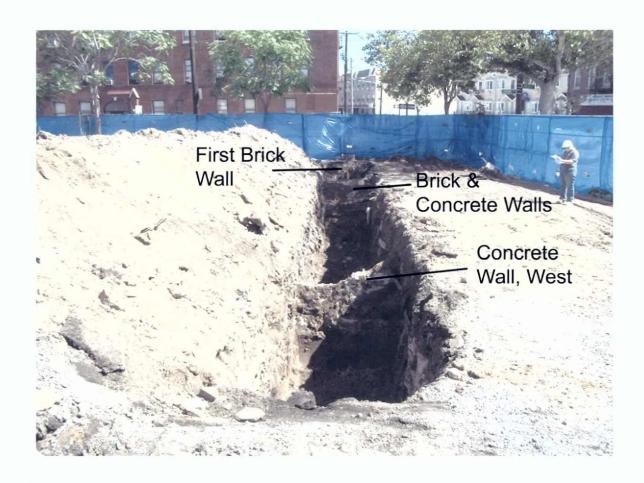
View of Backhoe Trench 4002, facing east, illustrating western concrete wall, brick and concrete walls, and eastern brick wall.
